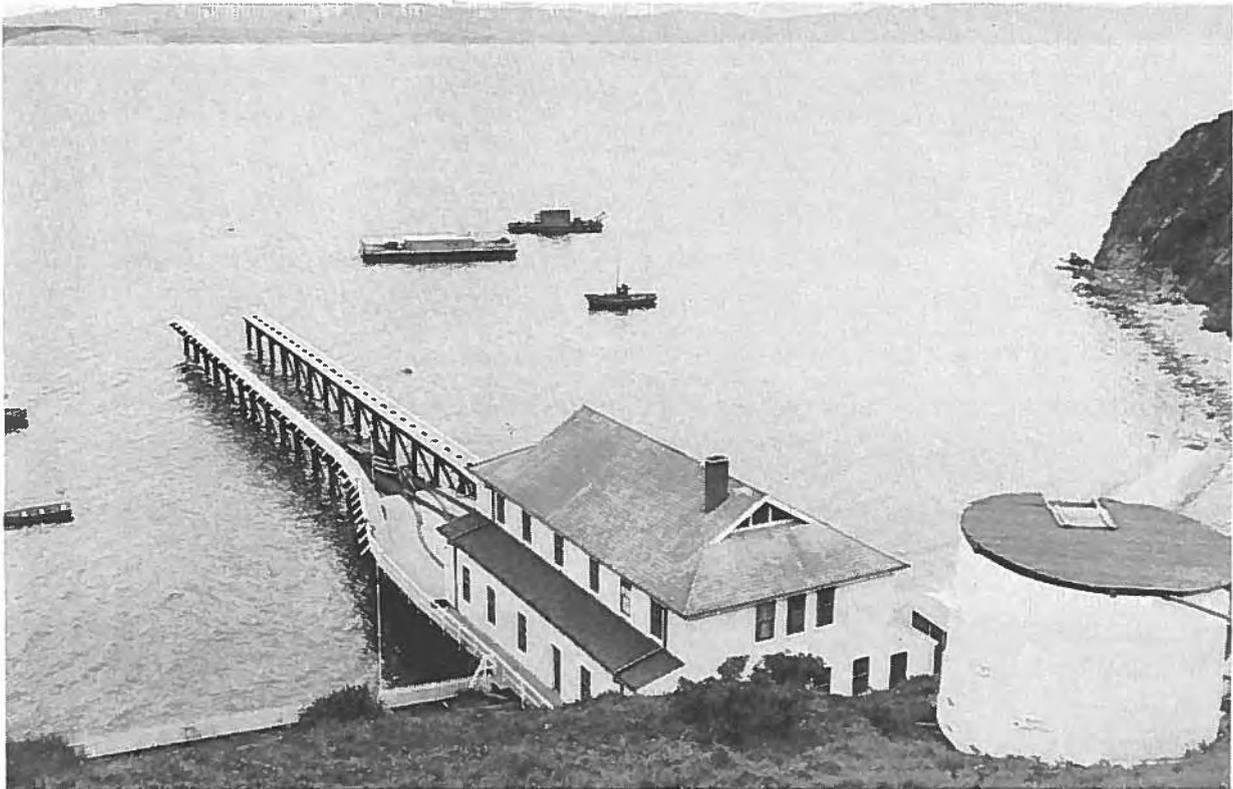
Shed addition with red roll roofing, 1946. (NPS)
